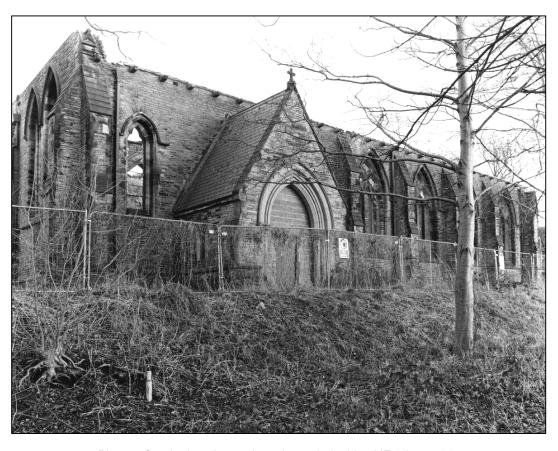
South elevation and south porch, looking NE (photo 1/3).
